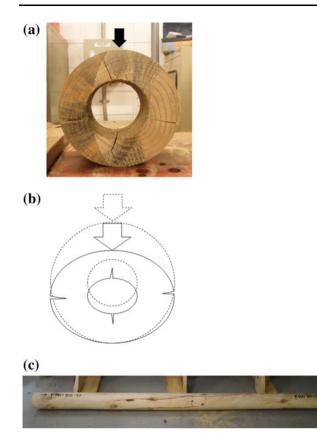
The failure mode for center-bored round timber beams; a cross-sectional flattening, b cross-section drawing of flattening failure, c longitudinal cracks as the result from cross-sectional flattening
